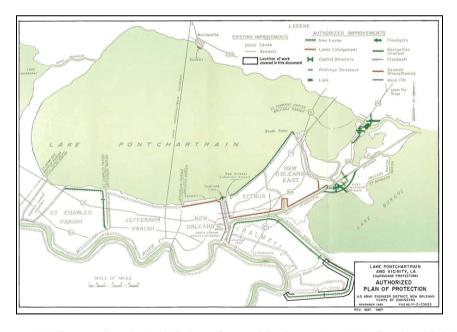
Proposed 1965 protection plan by U.S. Army Corps of Engineers along N.O. East Land Bridge.
